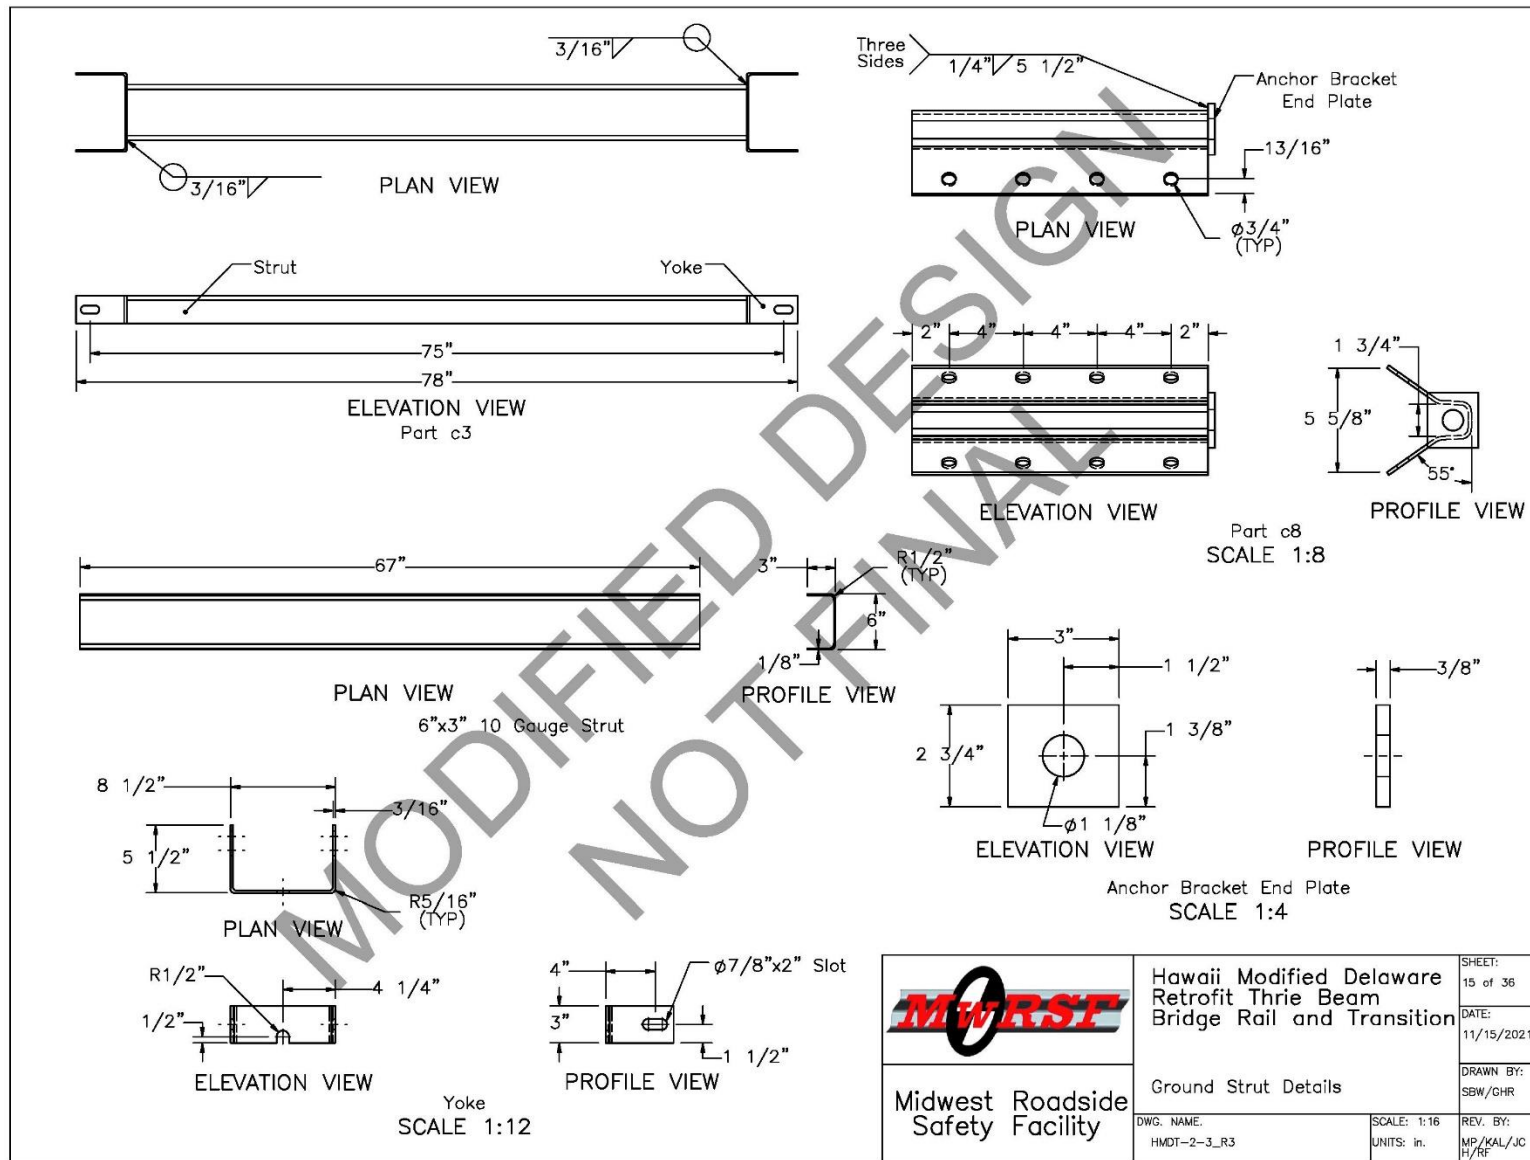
Ground Strut Details, Test Nos. HMDT-2 and HMDT-3
